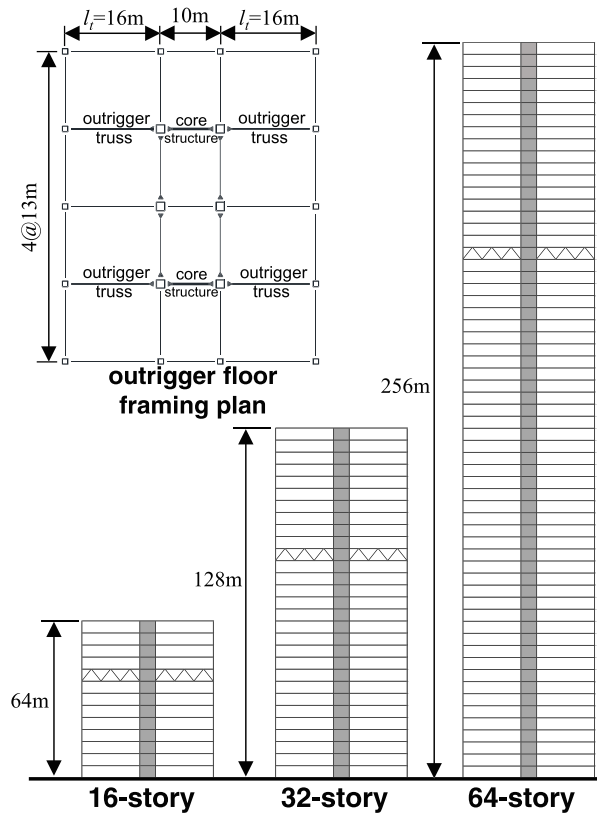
Elevation and outrigger floor framing plan of analytical models
